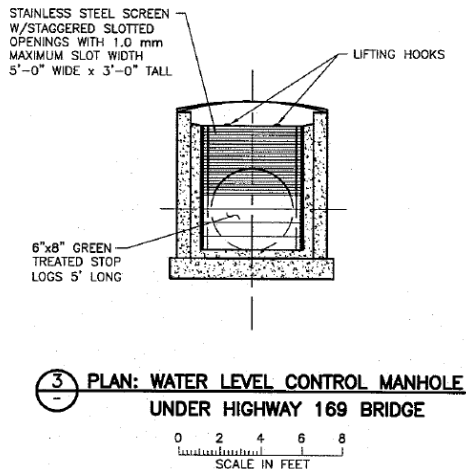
Southeast Anderson control structure macrophyte screen – plan view
